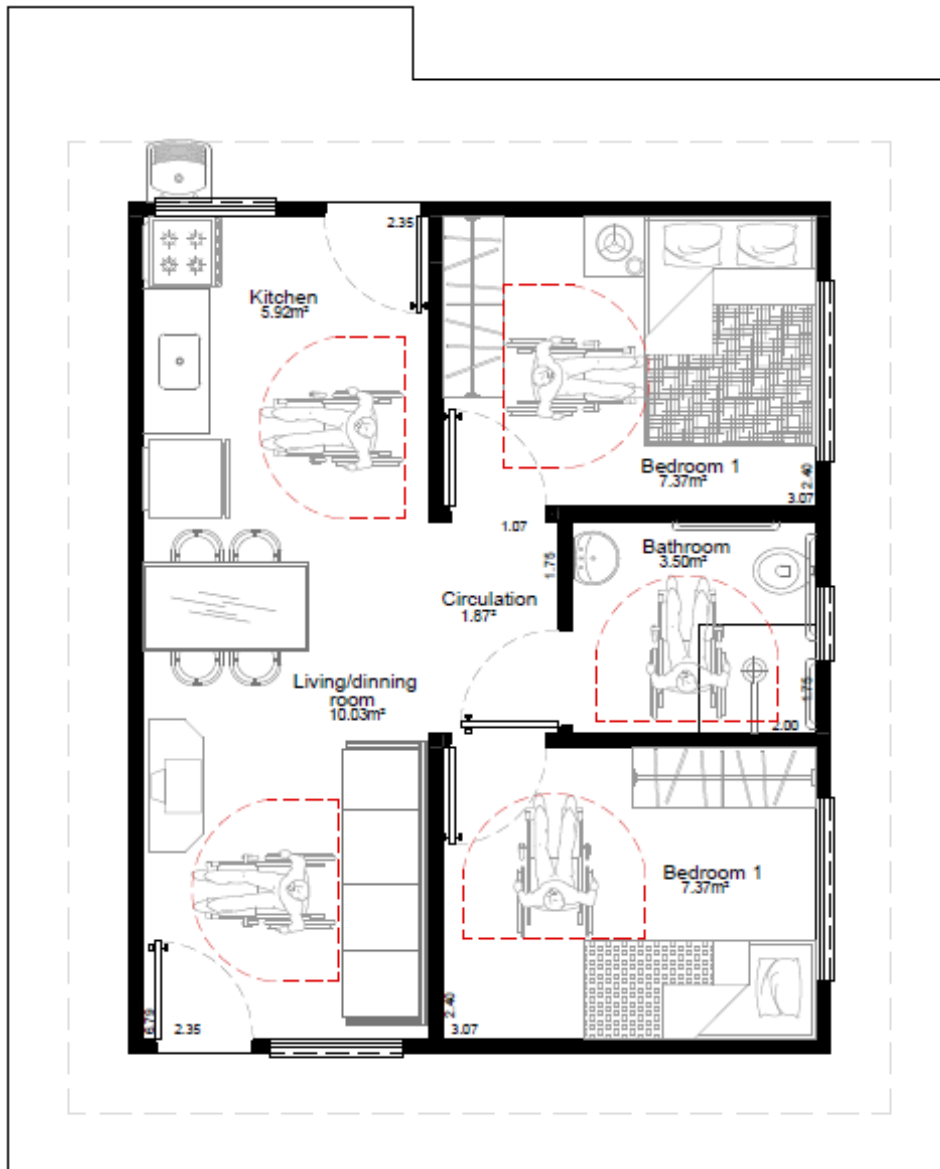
Floor plan of a house of Jose Maksoud adapted for people with special.
